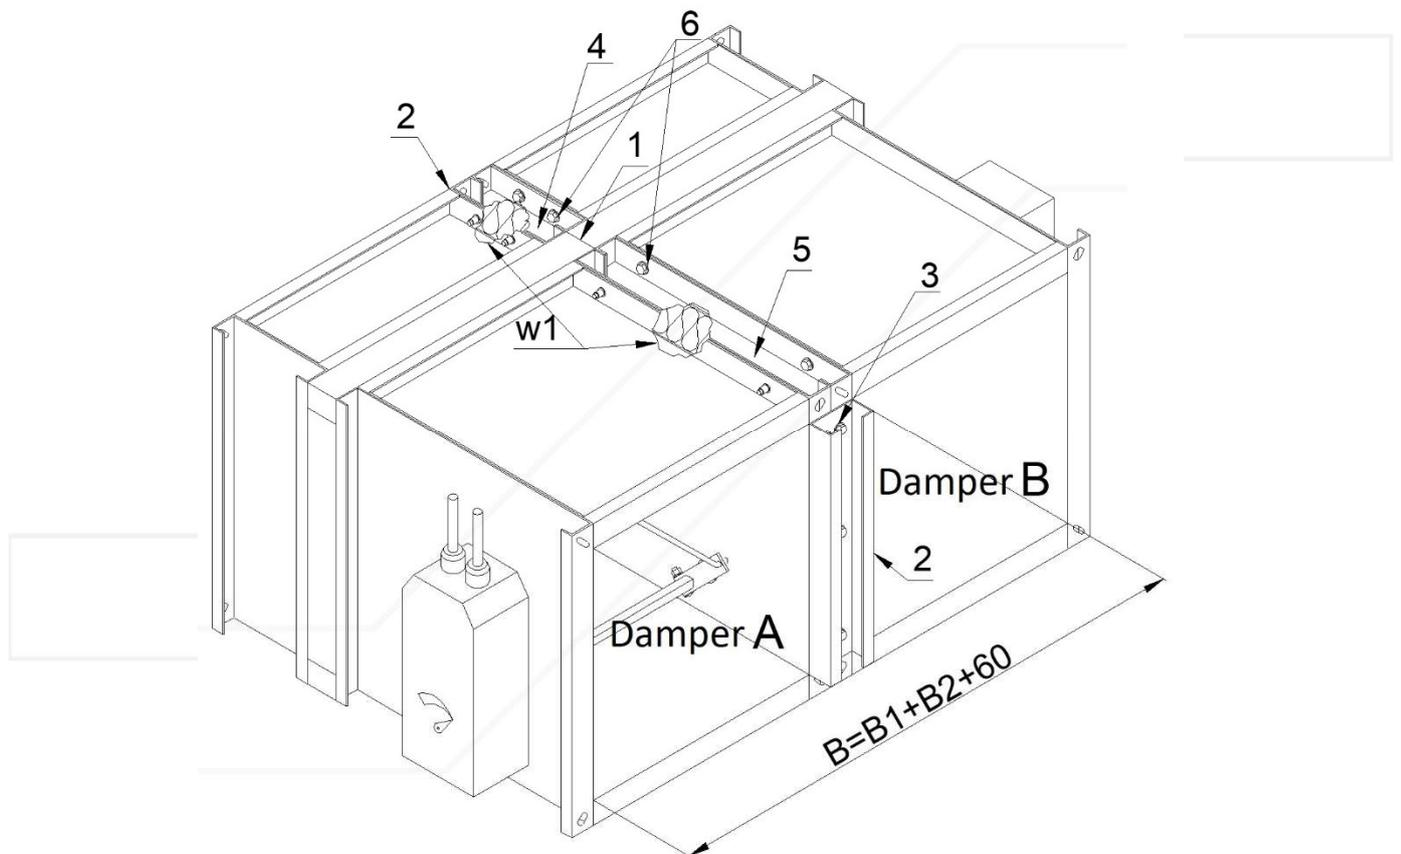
Arrangement 3 – horizontal battery consisting of two fire dampers KWP
